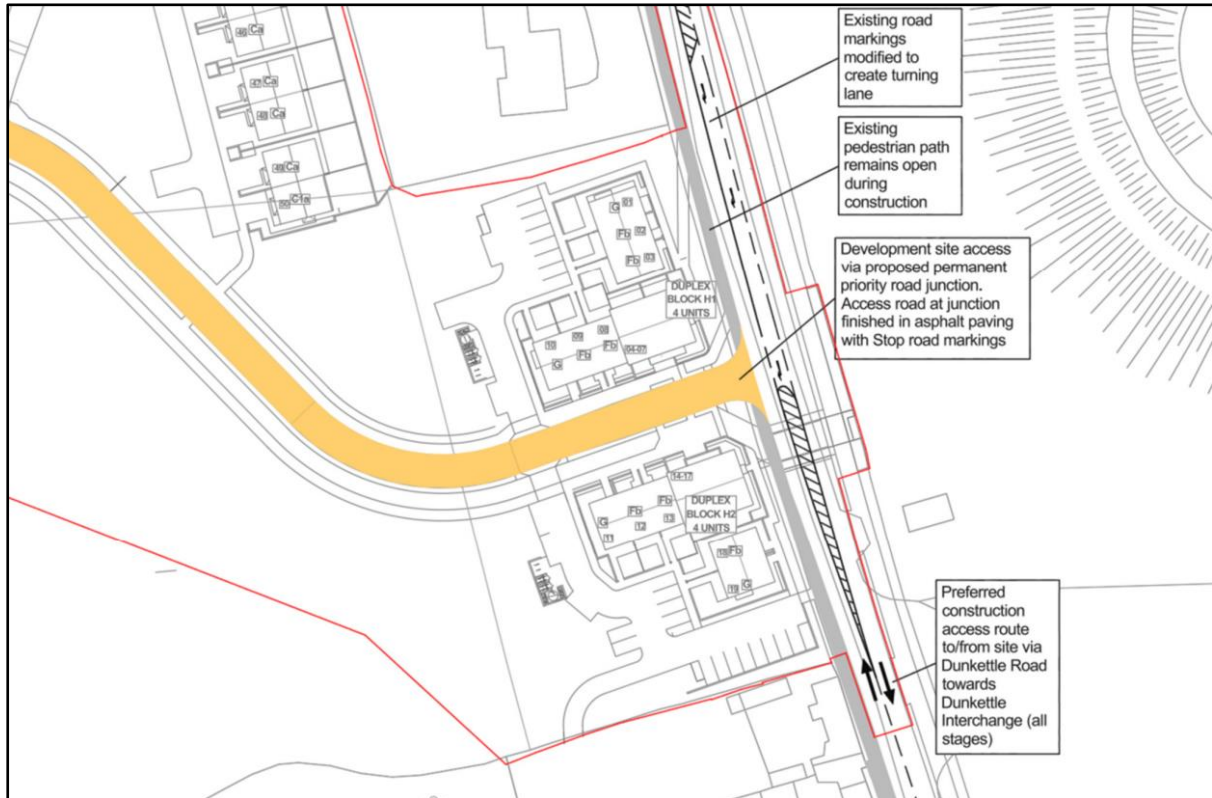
Site Access on Dunkettle Road (Source: JODA)
